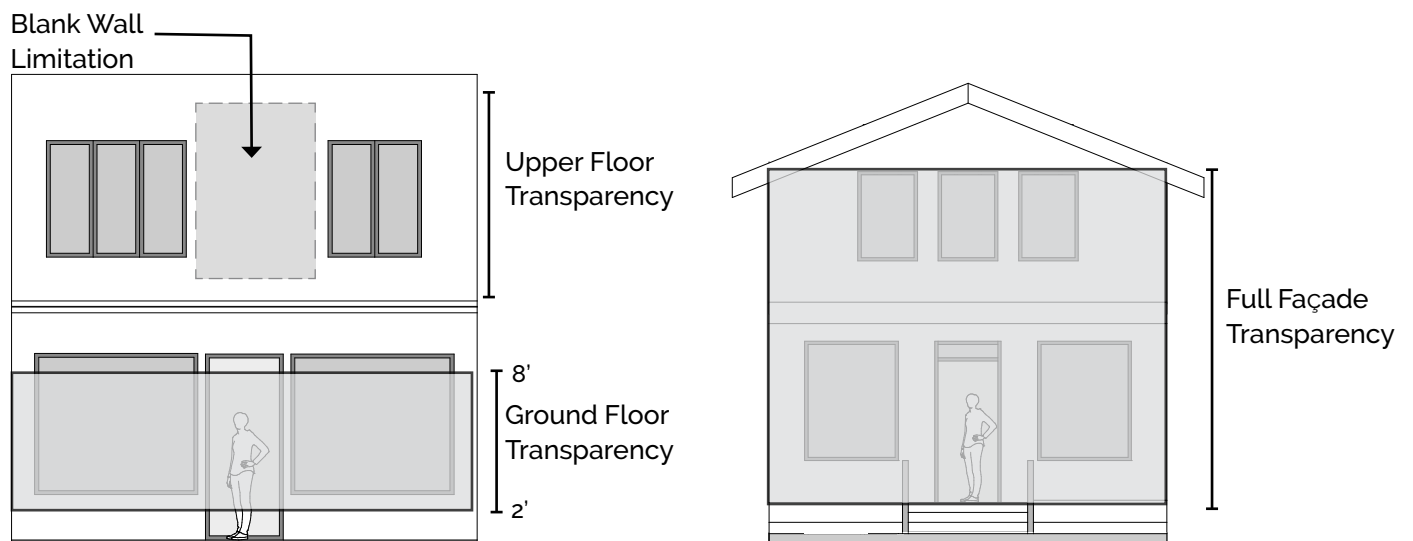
Measuring Transparency: Ground Floor, Upper Floor, & Full Façade
